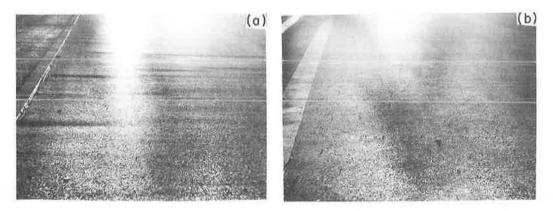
(a) Pavement laid with fixed screed paver; (b) pavement laid with floating screed paver.
